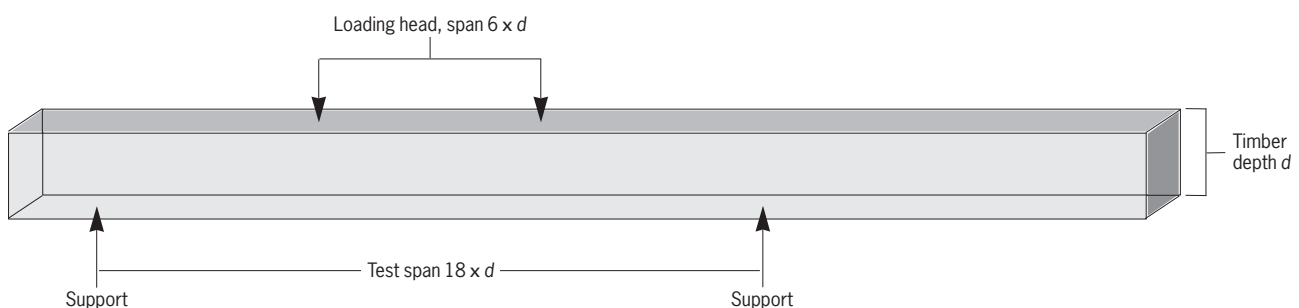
Schematic diagram of a bending strength test carried out on a timber specimen loaded as a joist
